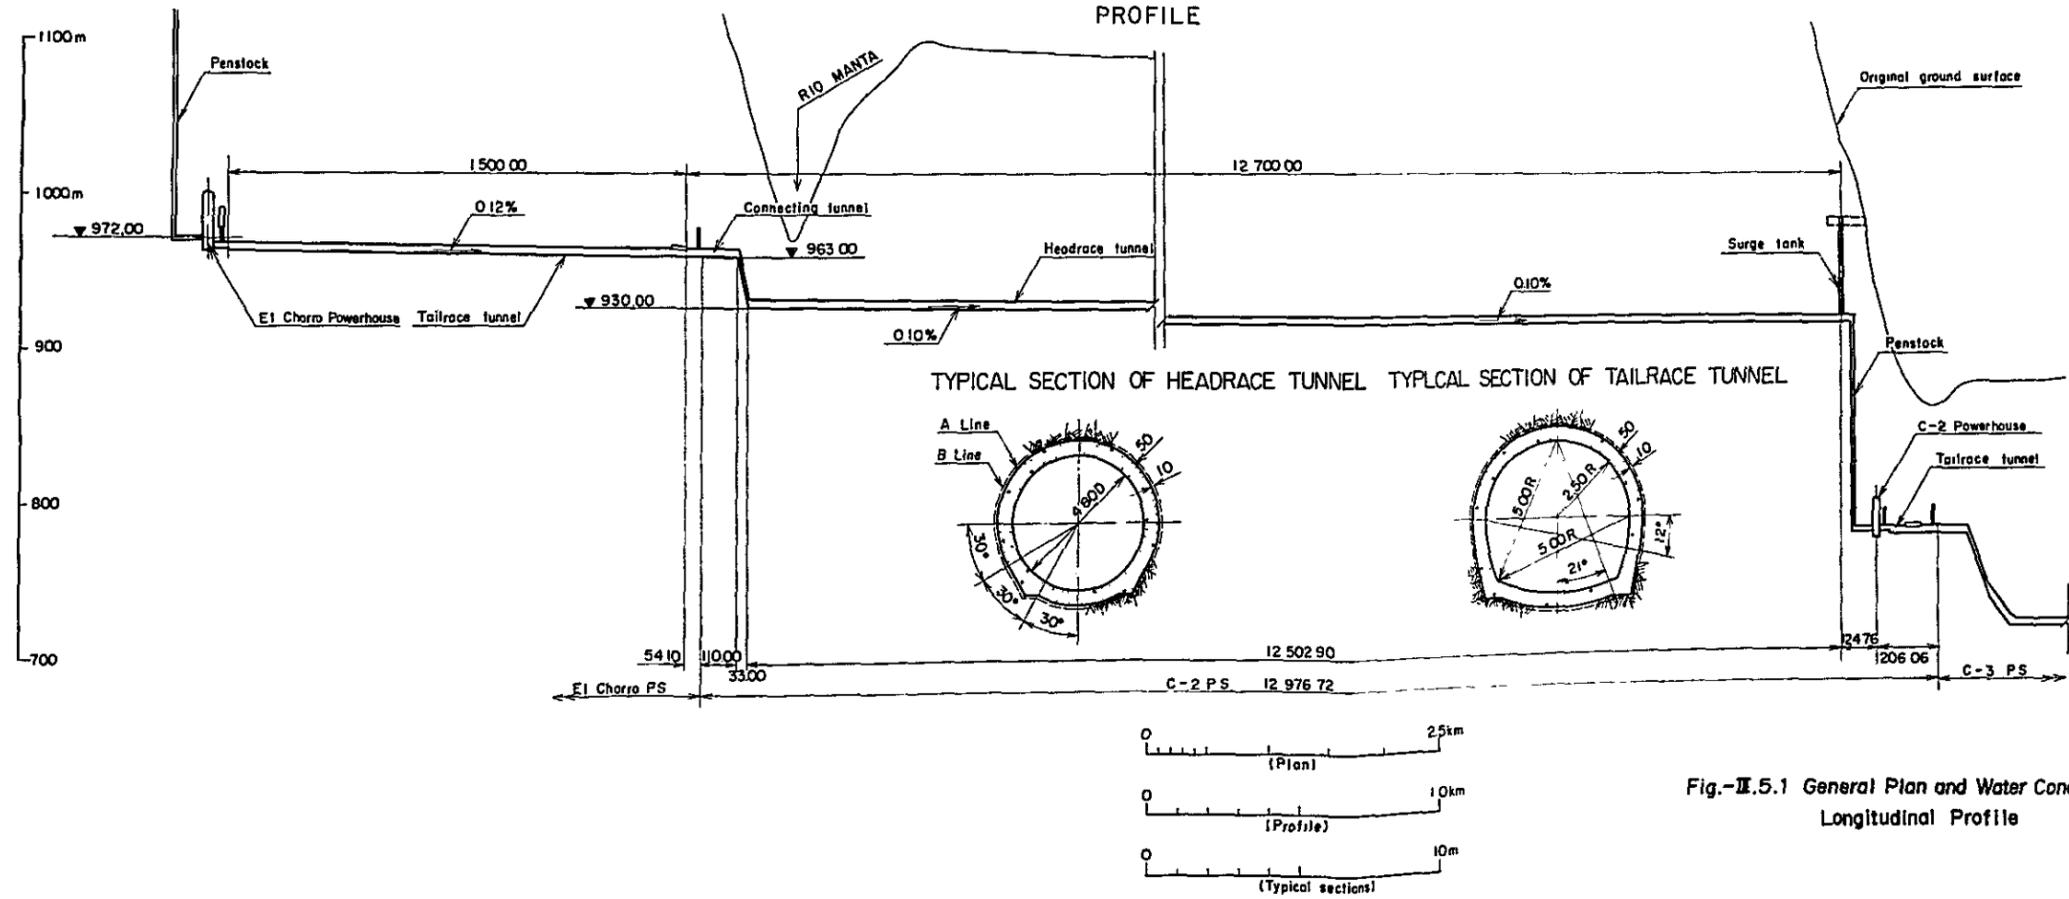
General Plan and Water Conductor (C-2) Longitudinal Profile
